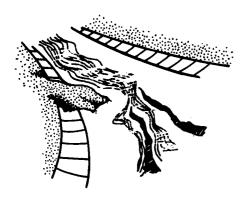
SPILLWAY OBSTRUCTIONS
